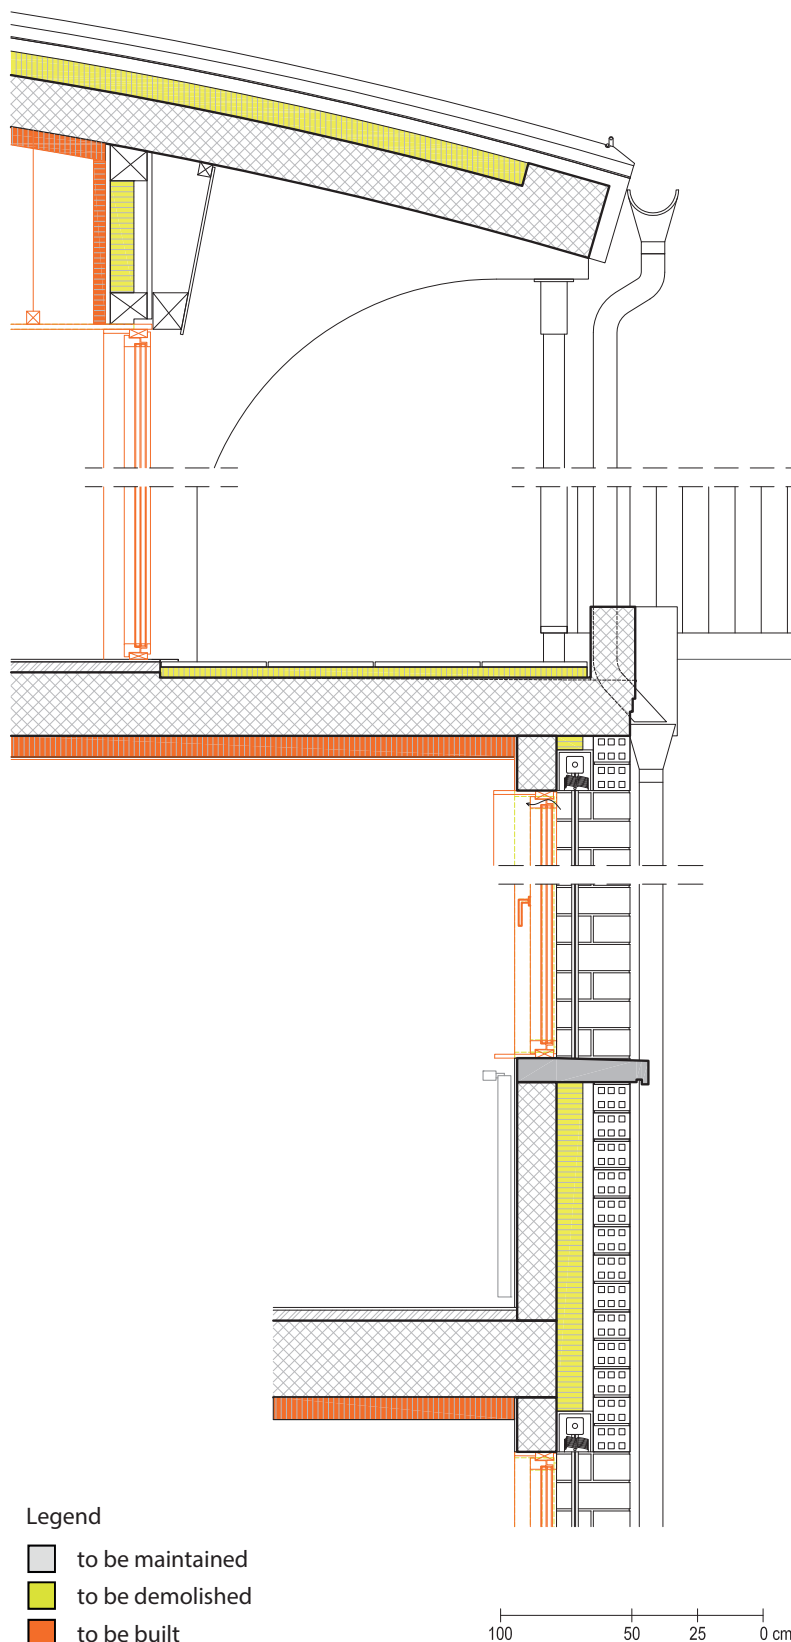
Façade constructive detail, S0-Baseline, Archetype 5.
